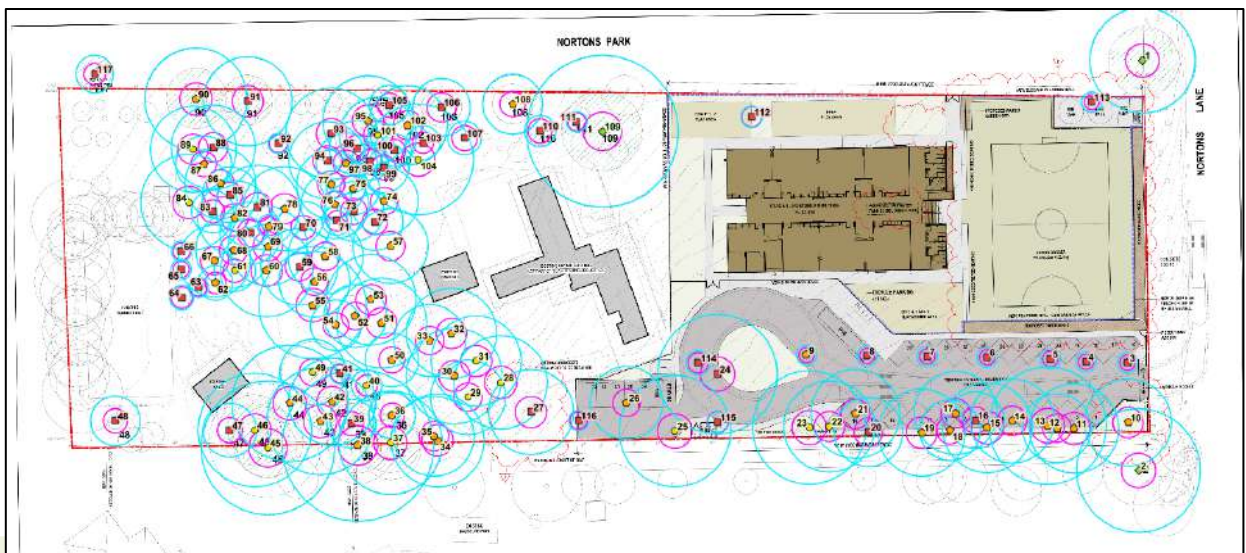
1566_TP-02 [D] EXISTING CONDITIONS - DEMOLITION PLAN.
